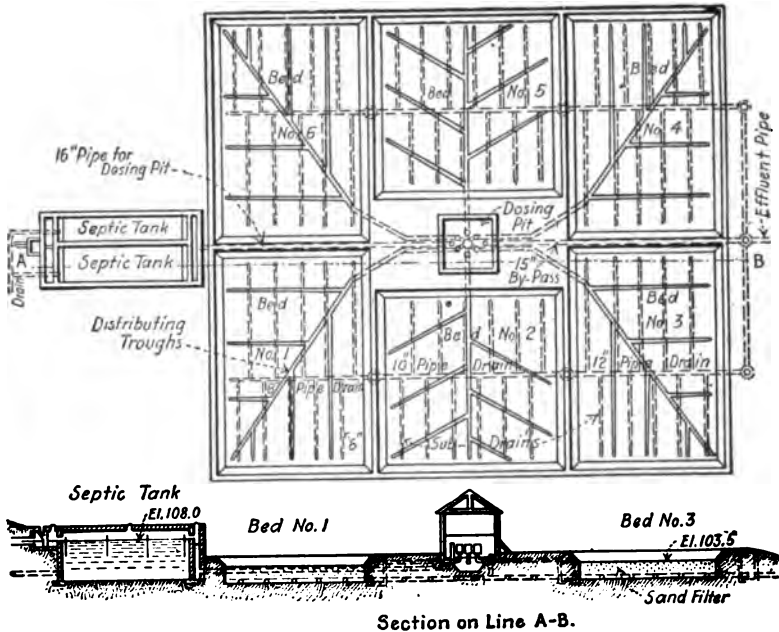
Plan and Section of an Intermittent Sand Filter Showing Central Location of Control House.
